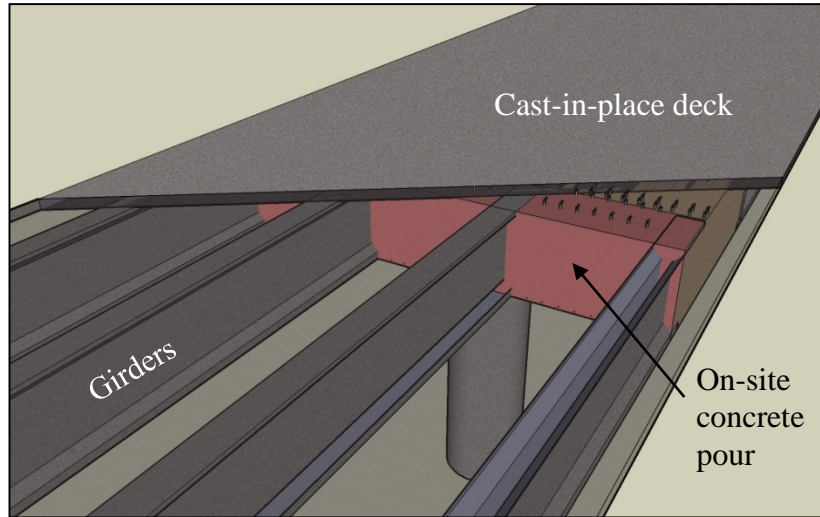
Concrete precast bridge members (Snyder, 2010)
